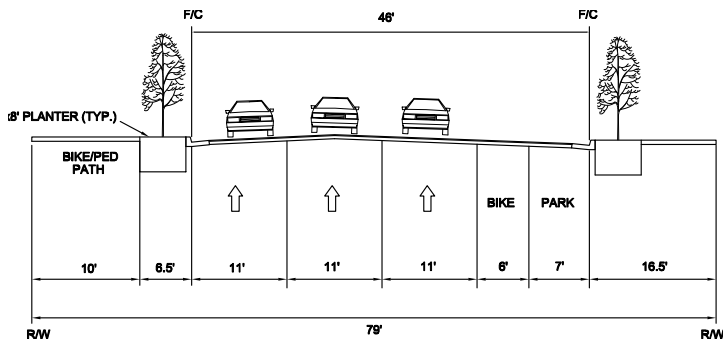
Railyards Boulevard - east of 7th Street (looking west)
